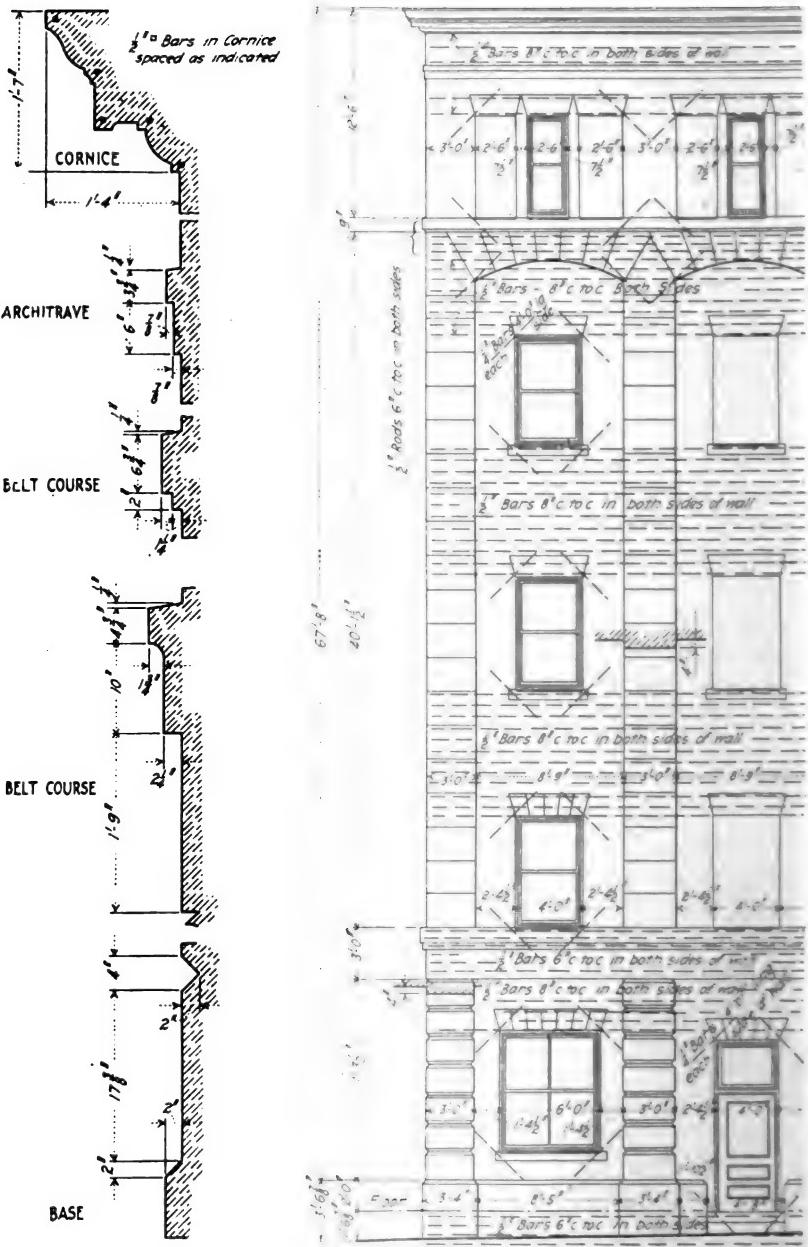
Front elevation of warehouse for Portland Savings Bank, Portland, Maine.
